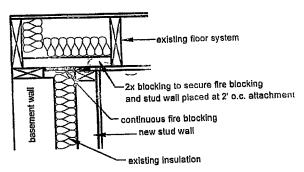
TYPICAL FIRE BLOCKING DETAIL WHEN STUDWALL IS OFFSET FROM BASEMENT WALL
